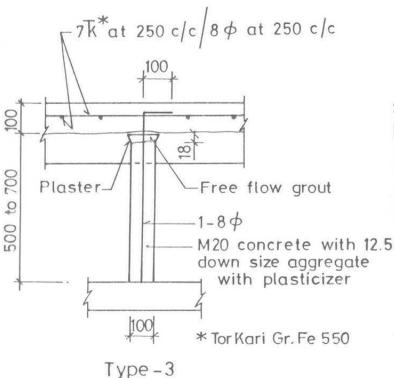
Details of concrete pile with reinforcement over the raft slab of agitator columns..
